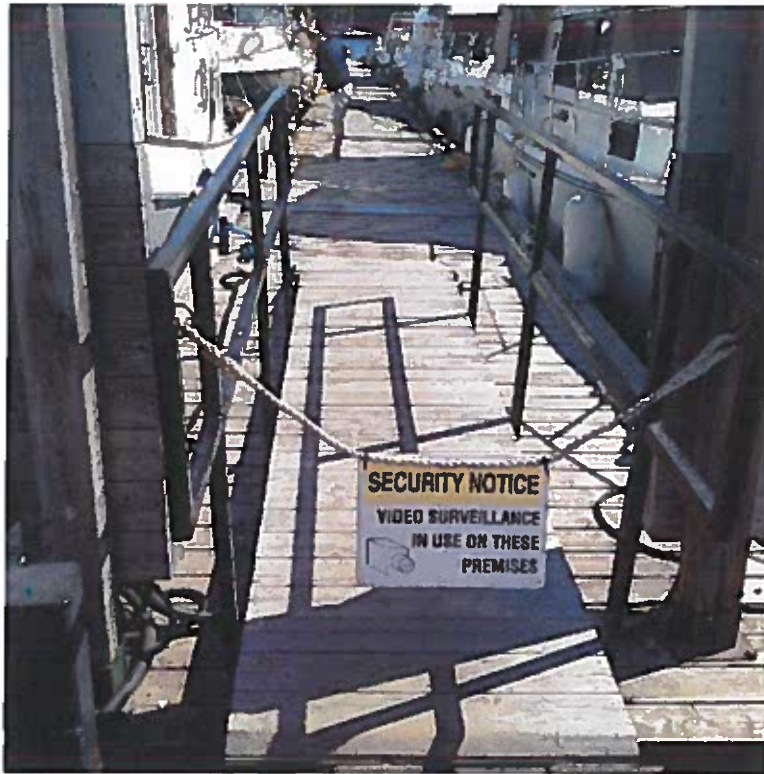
Pedestrian Access Ramp from West Wall to Steel Dock 1-2
